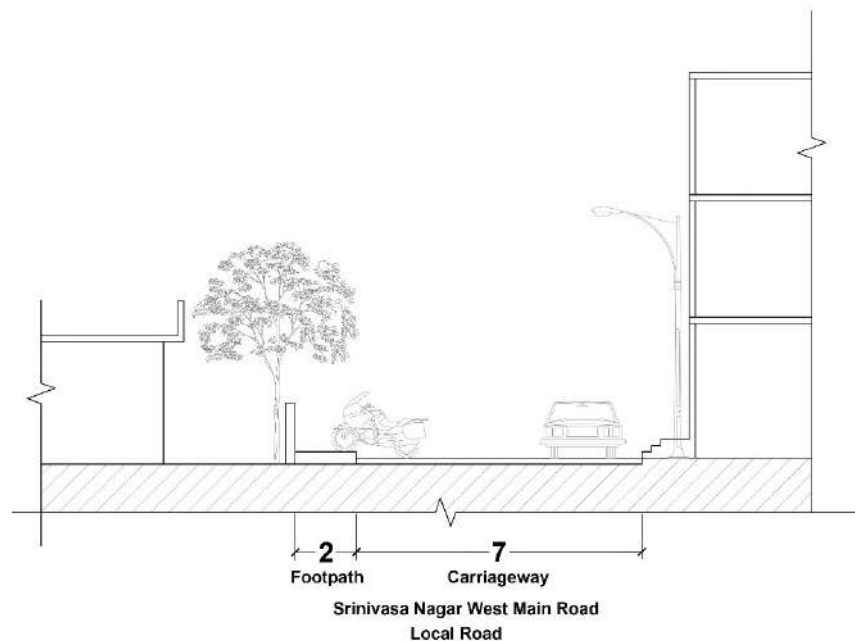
Cross section of Srinivasan Nagar West Main Road (G - G')
